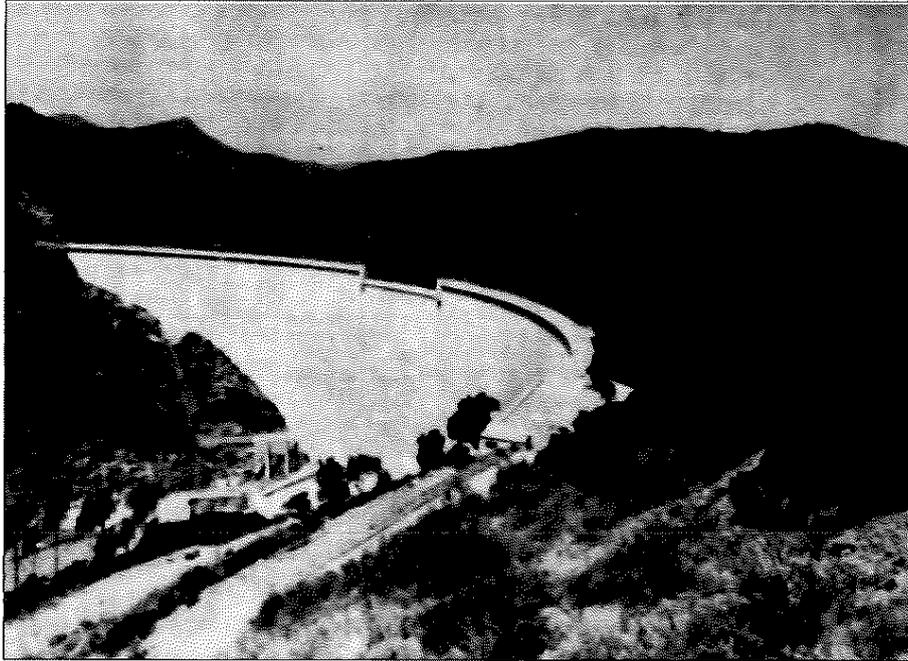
Malpasset Dam before failure (after Bellier, 1967)
